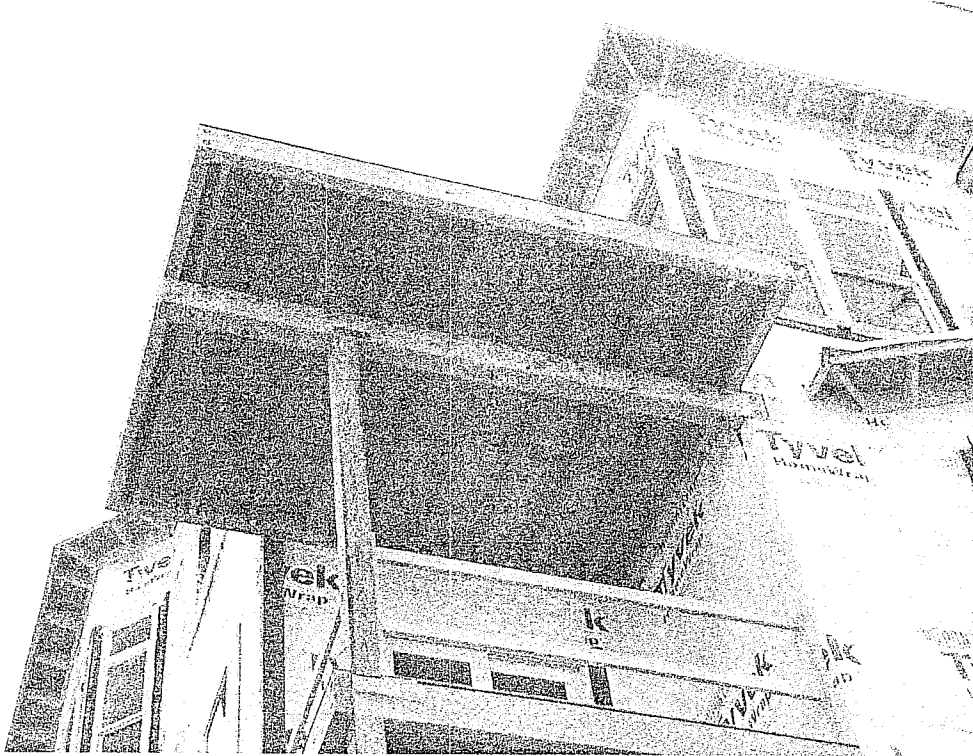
Top Floor Decks with Cantilever – Note 4x10PT at all railing supports
